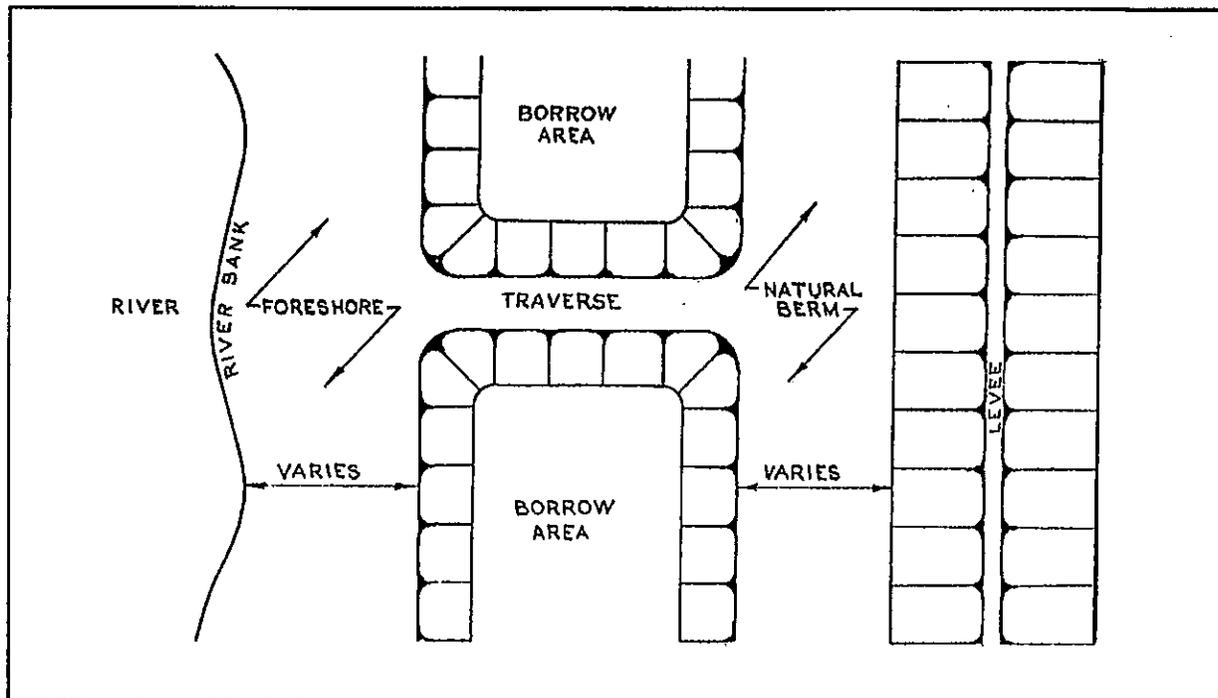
Plan of typical levee and borrow areas with traverse and foreshore
